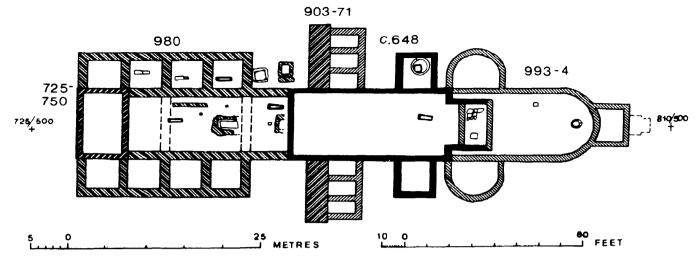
Winchester: Old Minster in its final stage c 993/4-c 1093/4; the plan shows reconstructed standing walls; 7th century minster church in black (scale 1:500)
